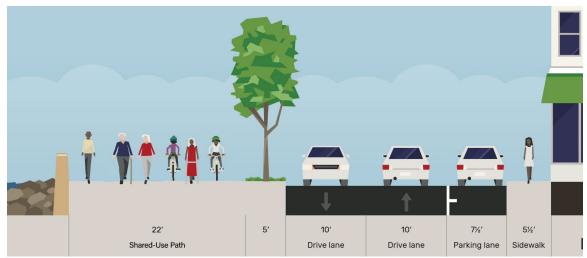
Option 4 Typical Cross Section – Shared-Use Path
